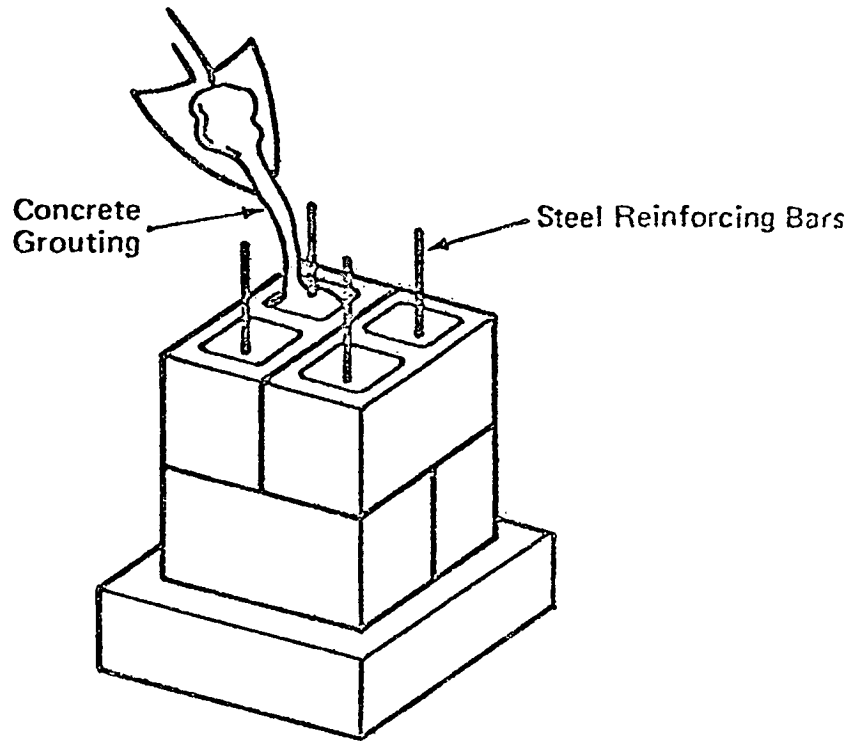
For piers exceeding 80 inches in height the concrete blocks must be filled with concrete grouting and steel reinforcing rods utilized.
